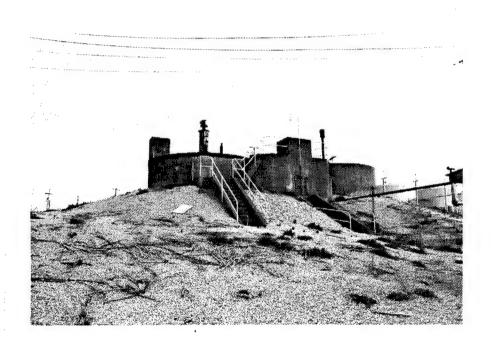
Building 608: Digestion Tank and Waste Gas Barn.
